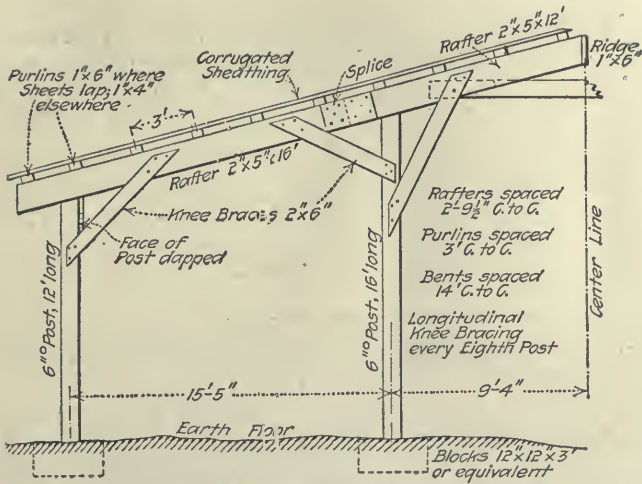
TYPICAL CROSS-SECTION OF WAREHOUSE SHED
